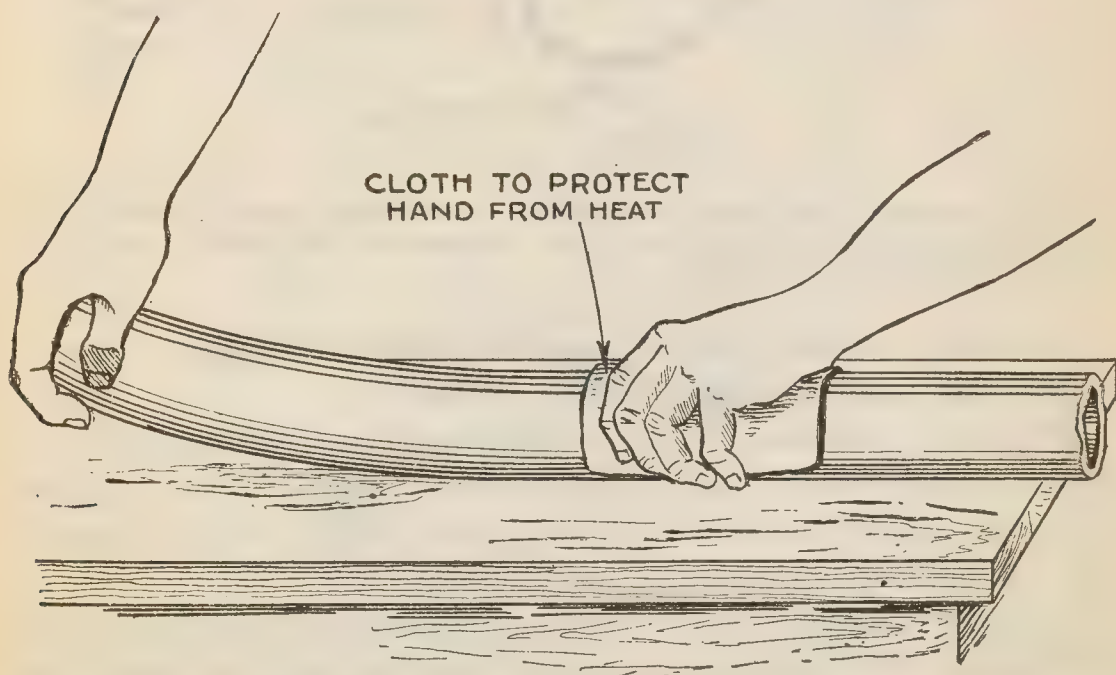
,526.—*Bending with dummy and dresser, 2.* First bending.
